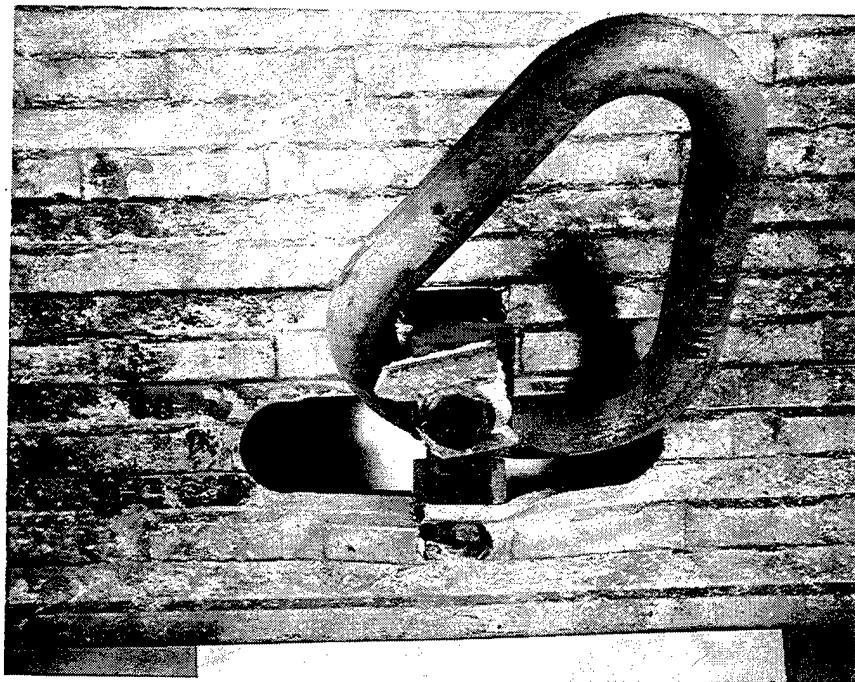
Close-up view of the damaged lifting device at the oblong hole in Figure 66 after removal from the testing machine. Note a small section of the deck panel sheared from the upper edge of the oblong hole, where the final failure of the lifting device occurred.
